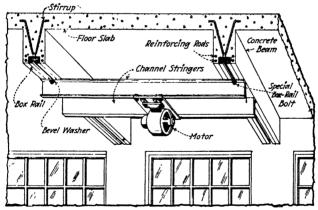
Motor supported at ceiling on channel-iron stringers which are fastened to box rails set in the beams.
